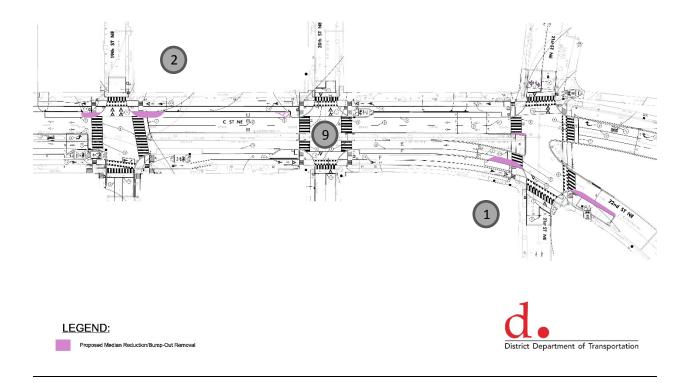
April Modifications to February 65% Design—19th Street NE to 21st Street NE
